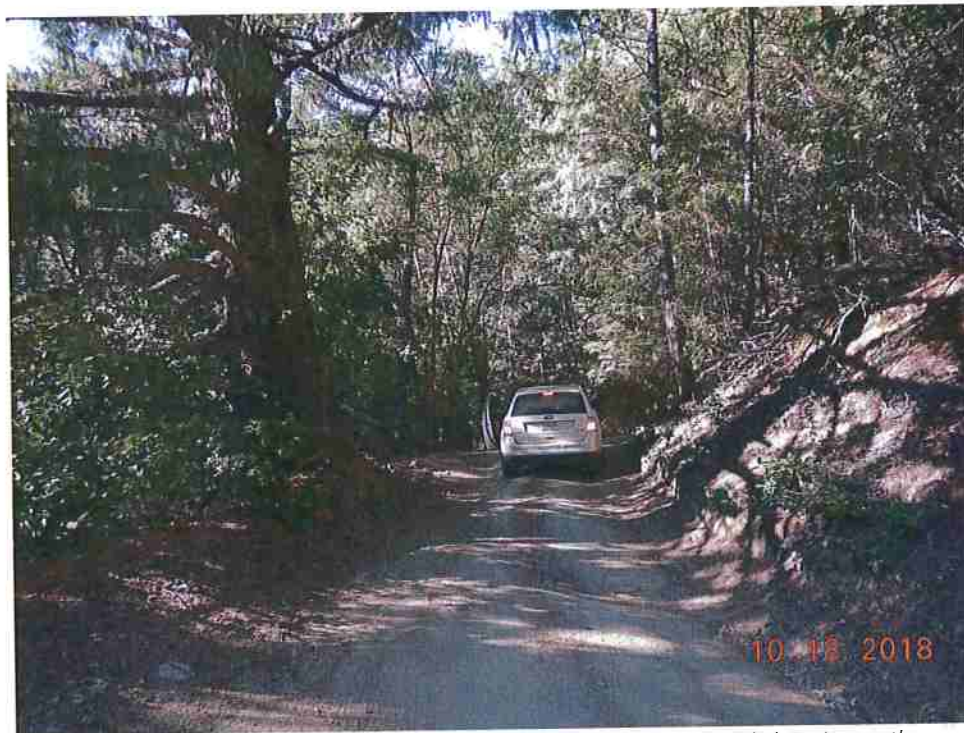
RP9. Pinch point and sight distance restriction. Turnout provided. Facing south.
